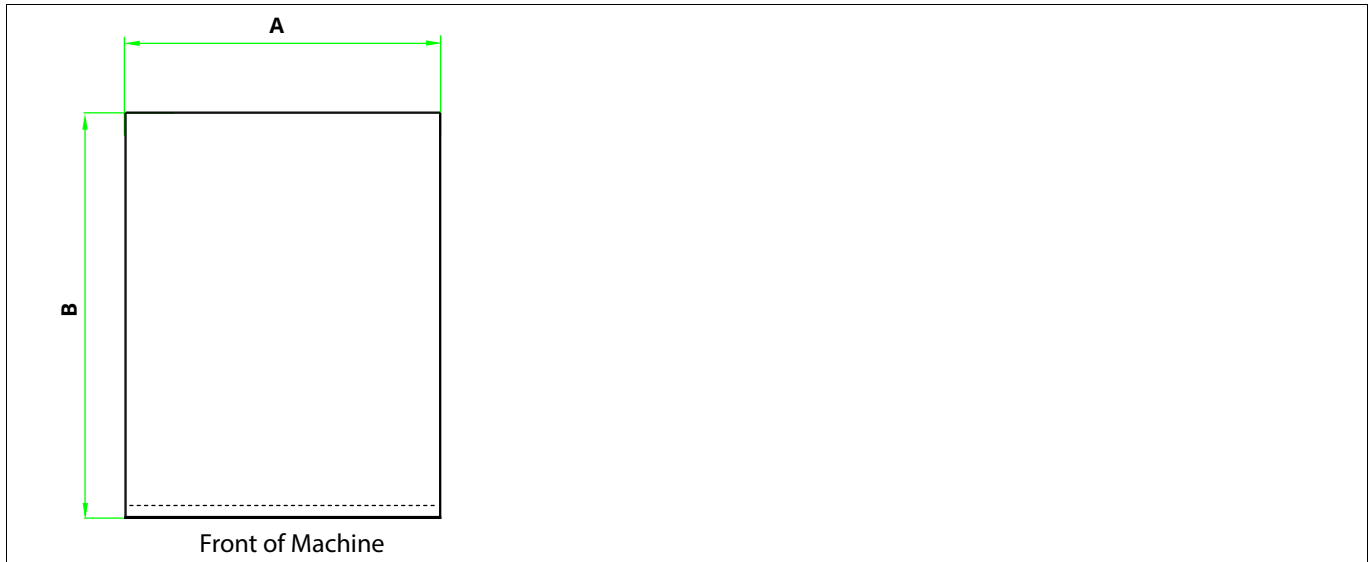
Top View of the Cutting Dimensions For Concrete Base
